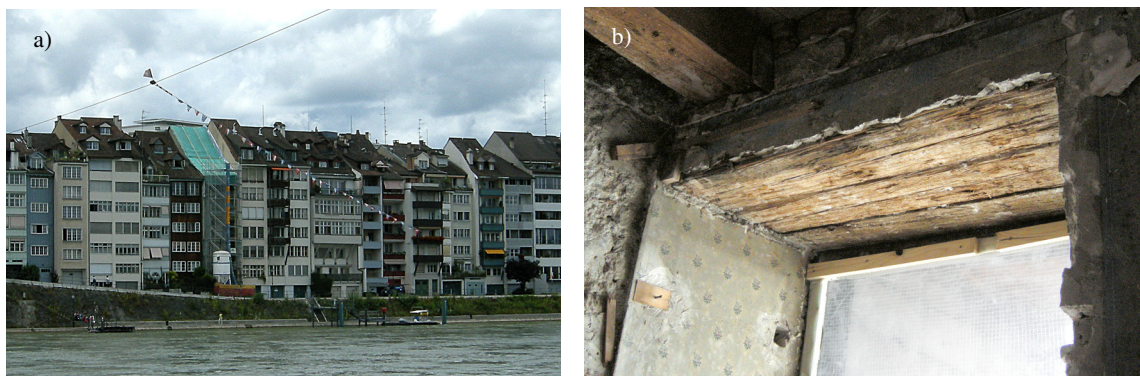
Old URM masonry house with timber lintel in Basel (Switzerland): Entire building (a) and lintel detail (b).
